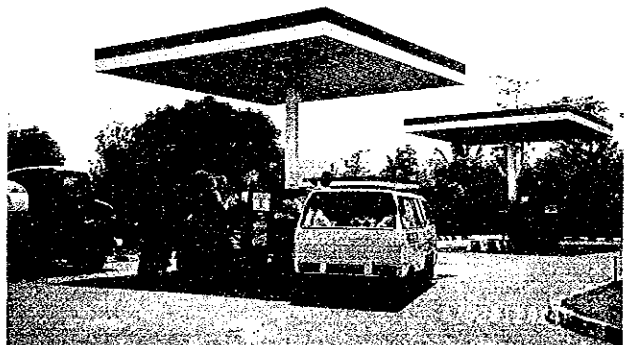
Gasoline Stand Roofing at Hill Side Area of Maumere City; Steel, Non Damage
